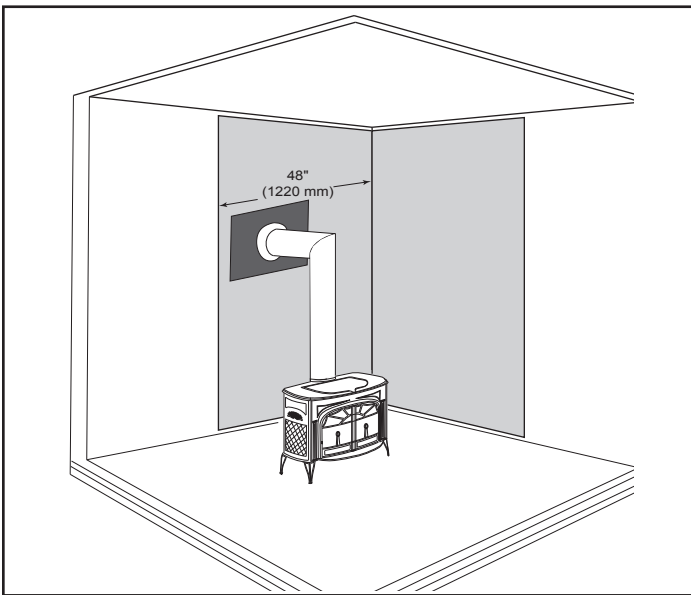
Parallel installation with rear wall pass-through, two wall shields. Reduced clearances to both rear and side walls. Wall shields may meet at corner if desired. Wall pass-through must comply with codes. Refer to "Special Installations."
